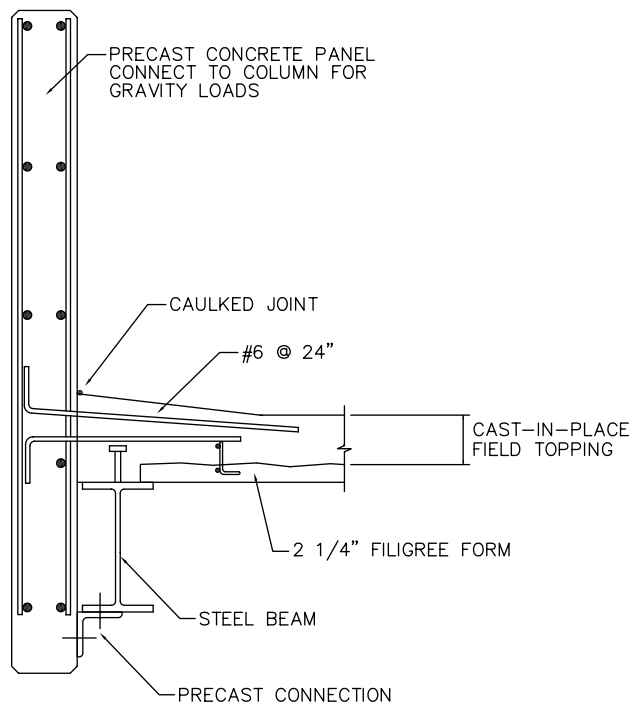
Typical Precast Connection to Steel Beam and Slab
